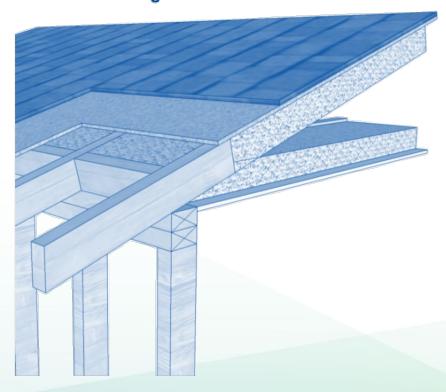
Unvented Attic Assembly With Insulation at the Ceiling and Between the Roof Rafters
